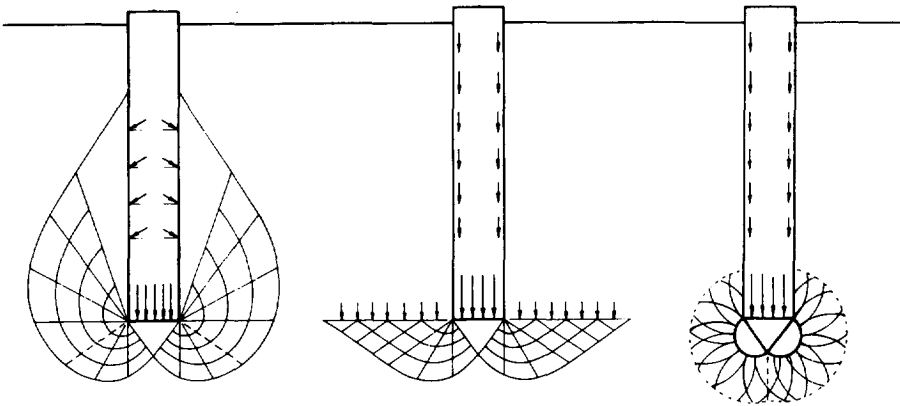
Failure patterns under deep foundations (Vesic, 1967).
